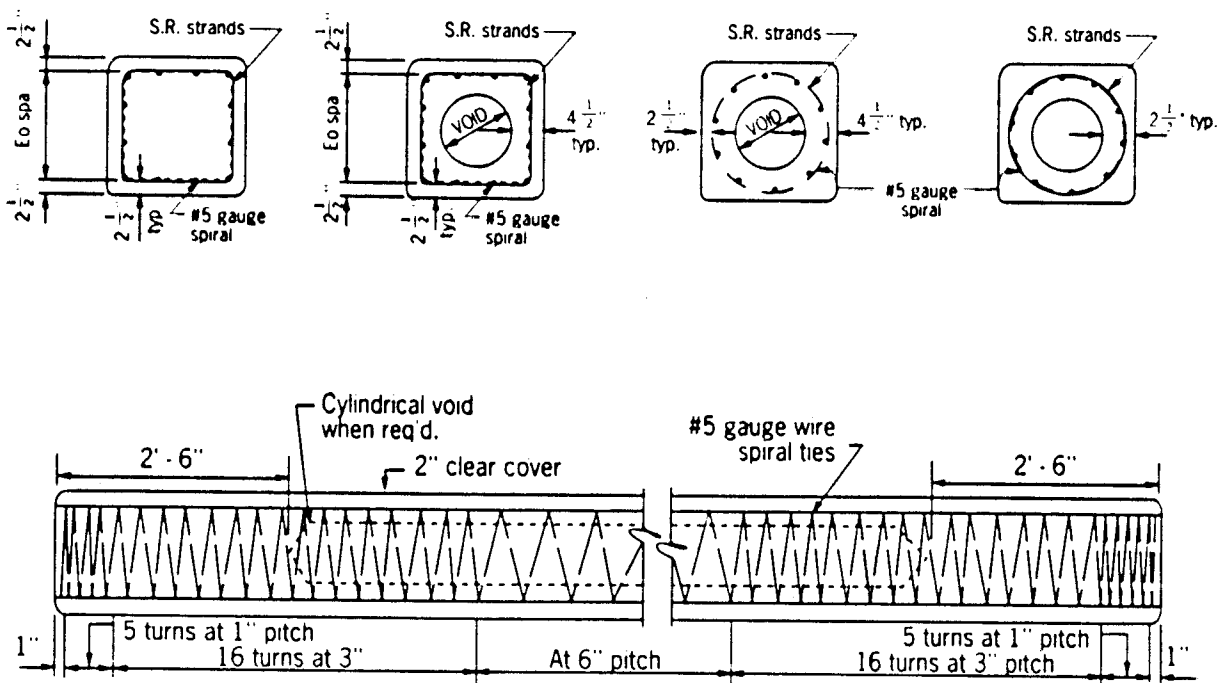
Typical design of a prestressed (pretensioned) concrete pile (ASCE, Committee on Deep Foundations, 1984).
